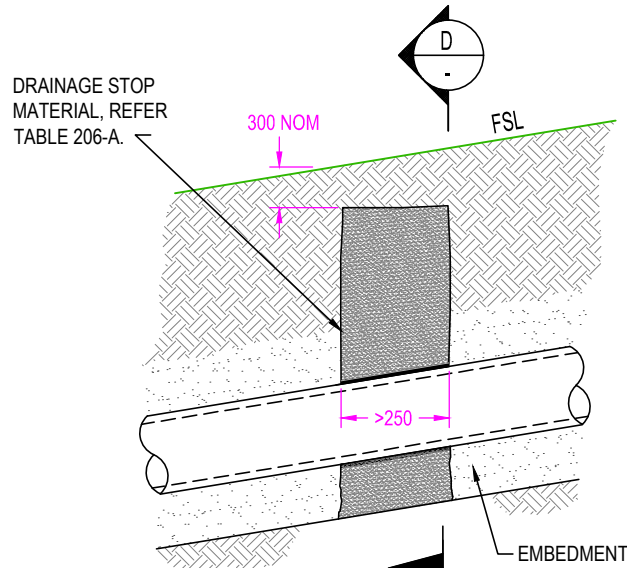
C: EARTHWORK TRENCH STOP (SECTION)
